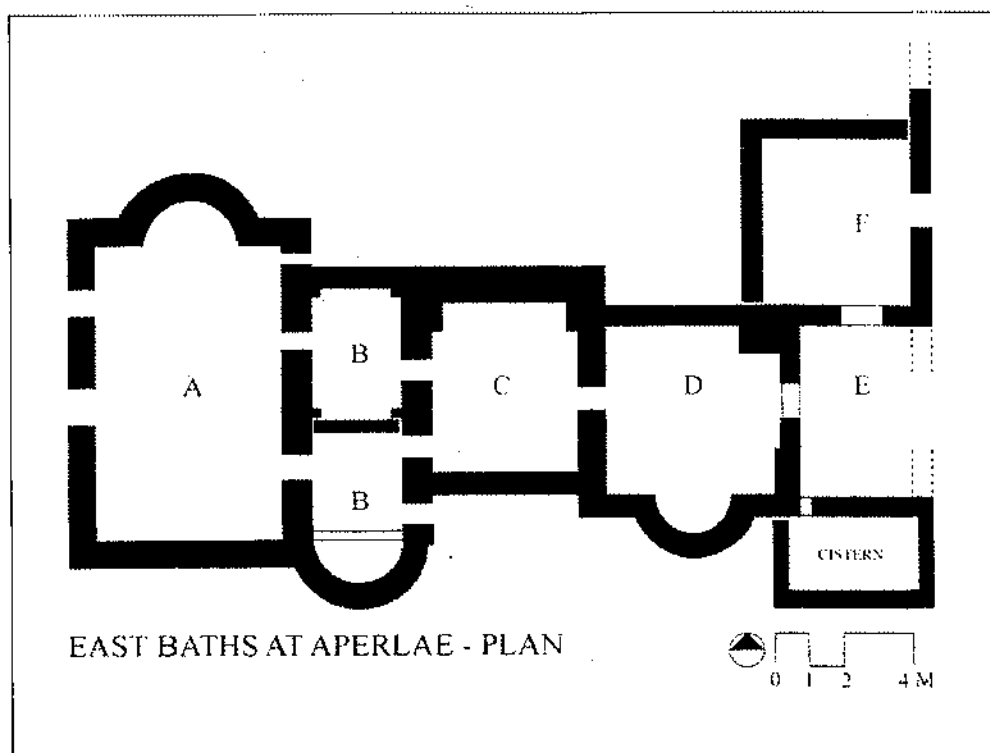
East Baths Plan (Wilkins and Brainerd)
